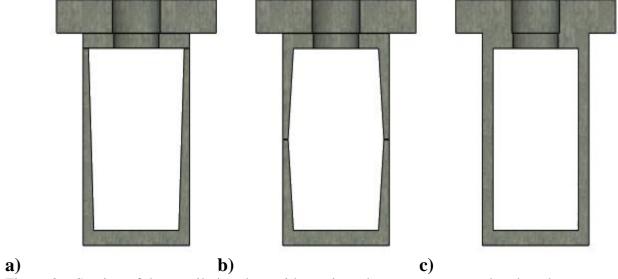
Section of the ventilation duct with an air outlet: a – one tray and a plate; b – two trays; c – monolithic structure
